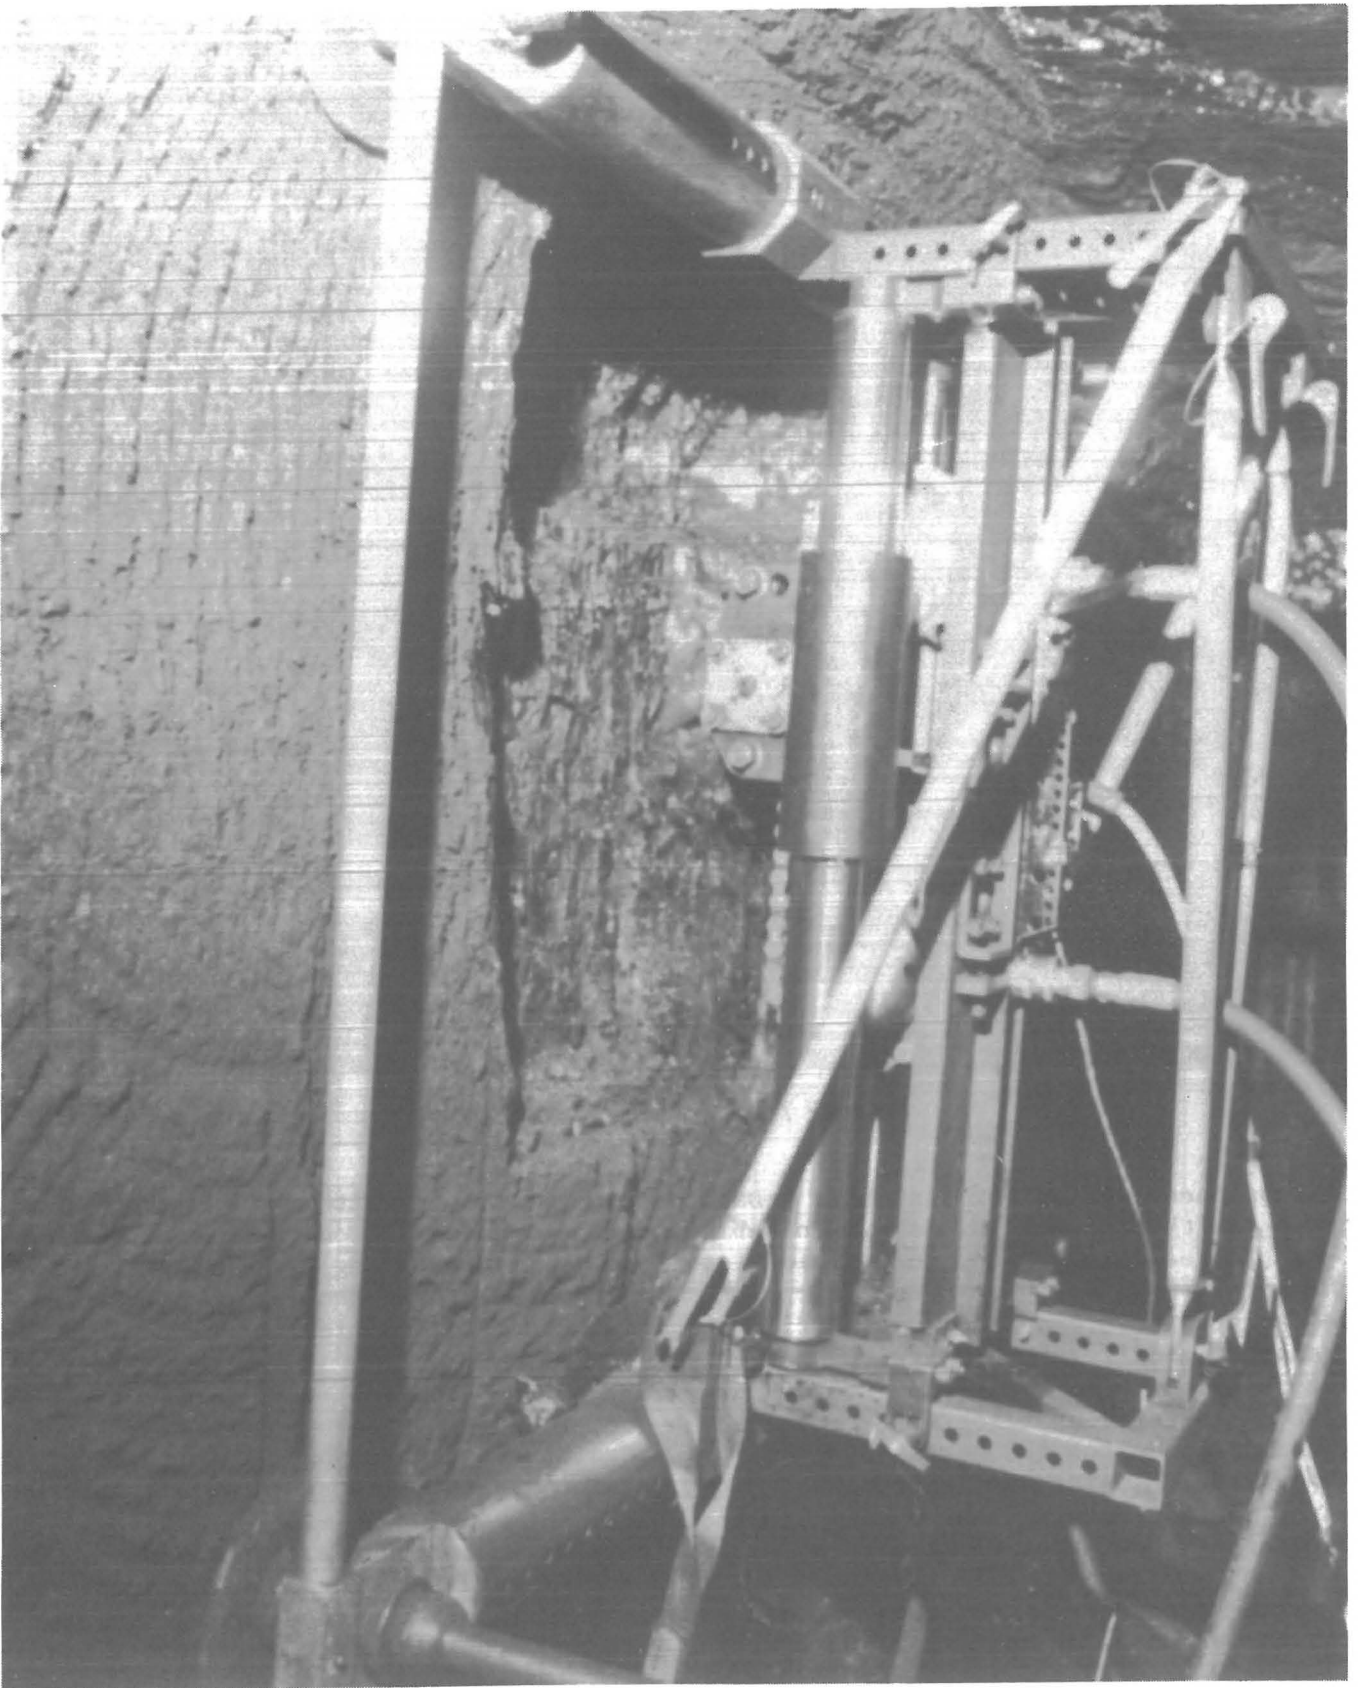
• Closeup of mast-and-cutter subassembly.
